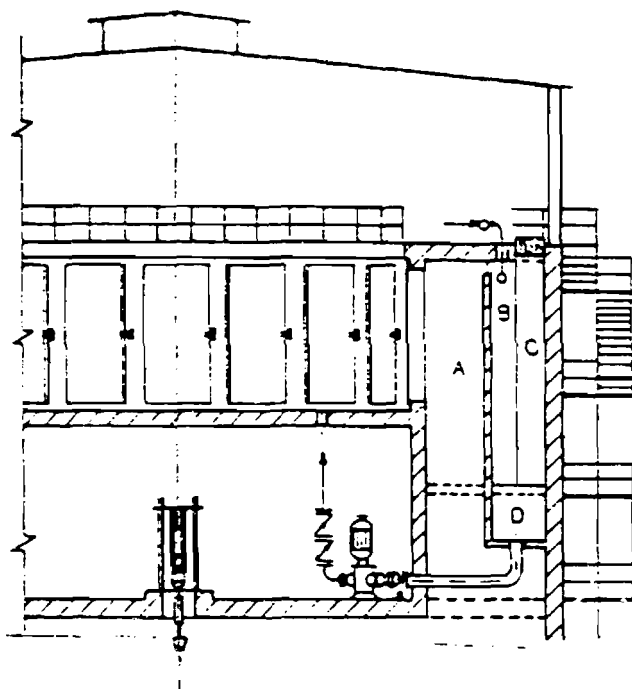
Top of prilling tower designed to incorporate wet scrubbing of cooling air
